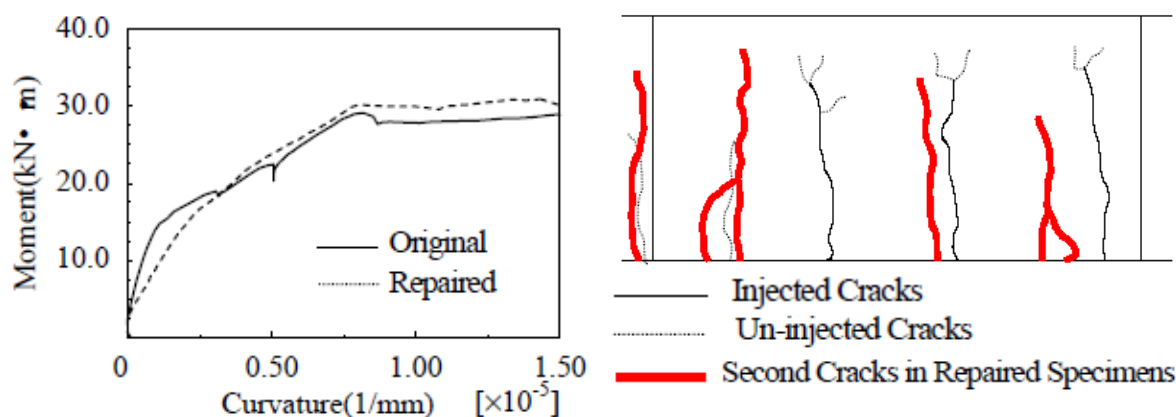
Moment-curvature (left) and cracking pattern (right) of prototype and epoxy-repaired specimens (Kunieda et al, 2001).
